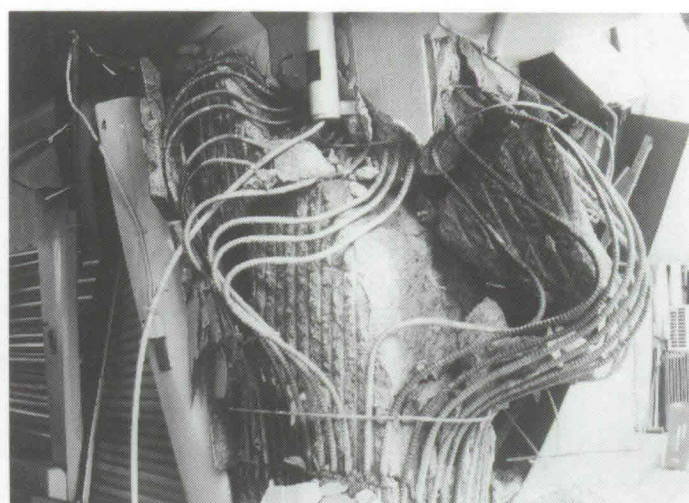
Failure of reinforced concrete piers of an overbridge (near Rokkomichi Station, Tokaido Main Line)
